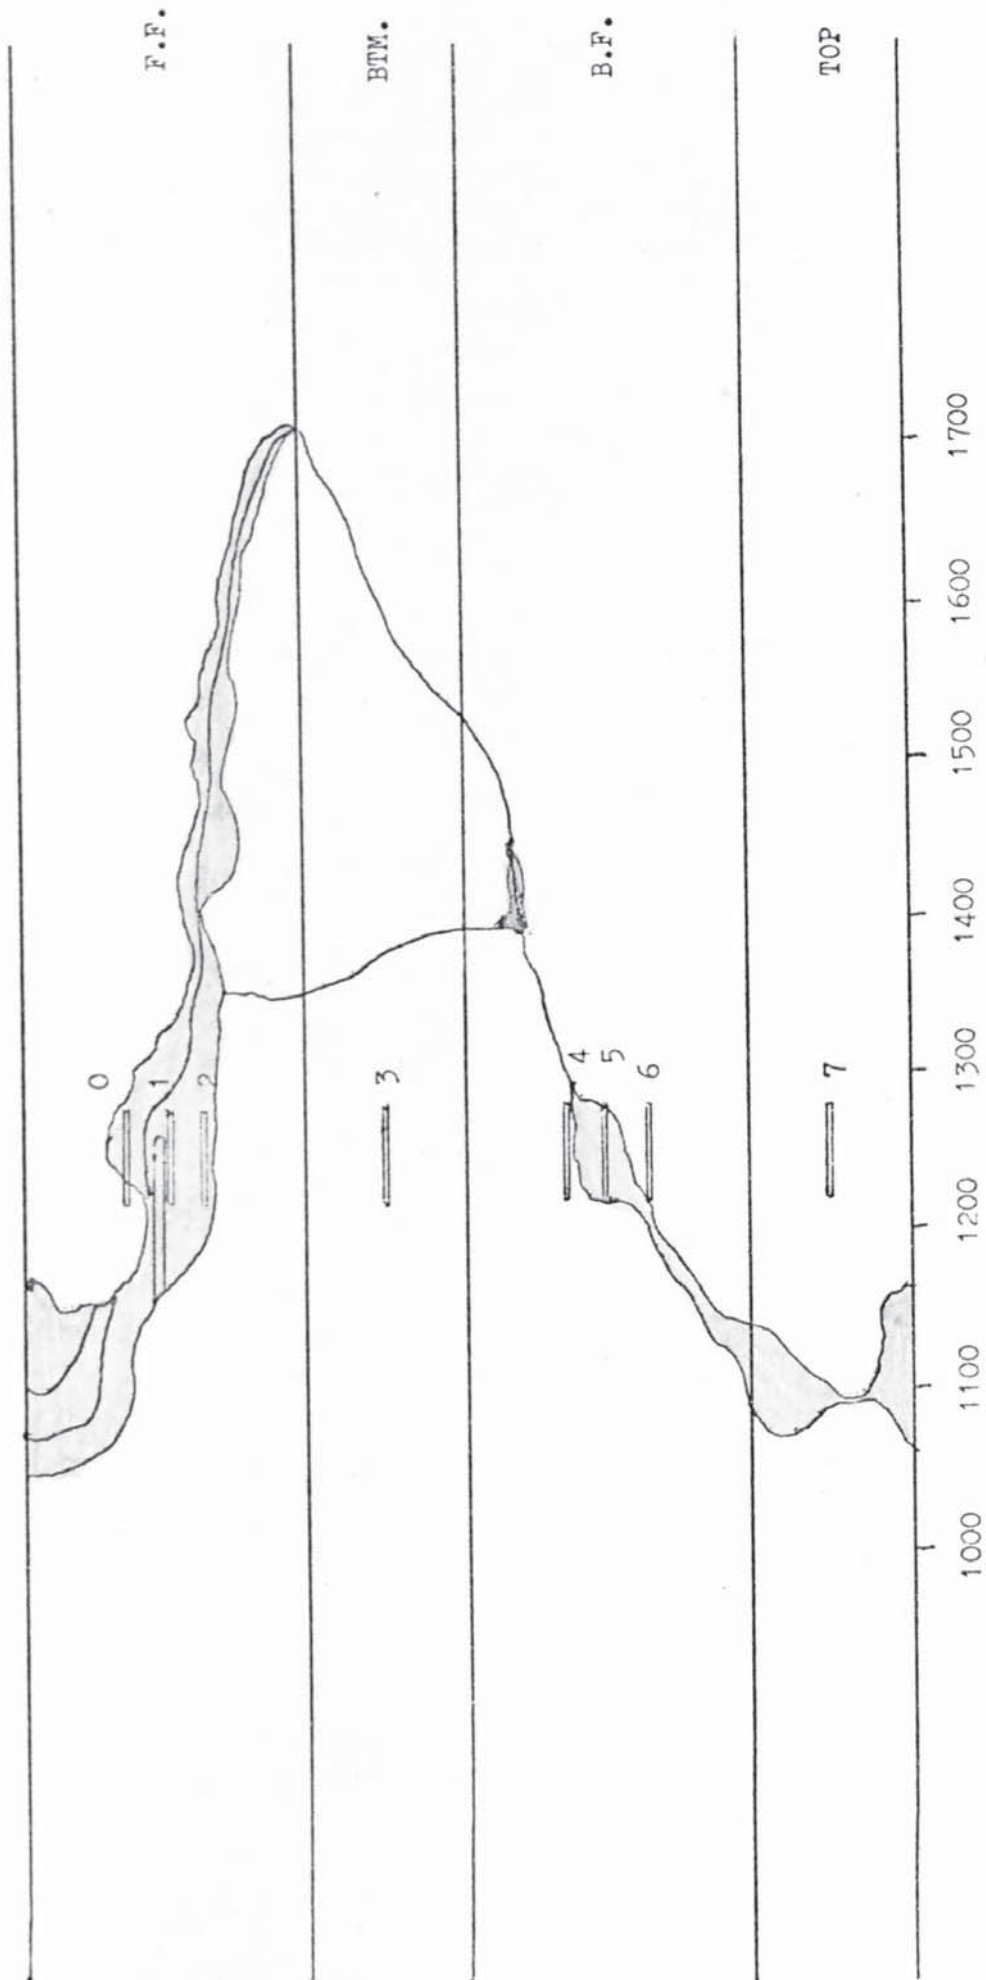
FAILURE CRACK PATTERNS - BEAM 27 (MODE 2)
